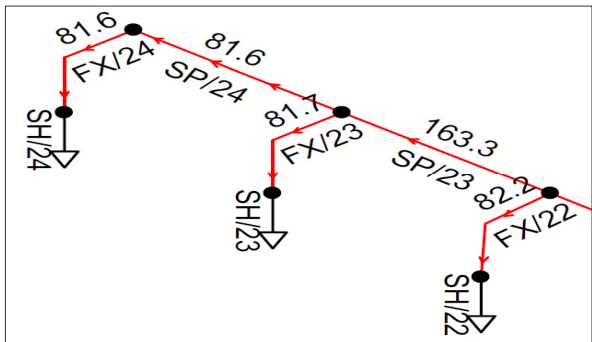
Diagram by hydraulic calculation (New steel pipe).
